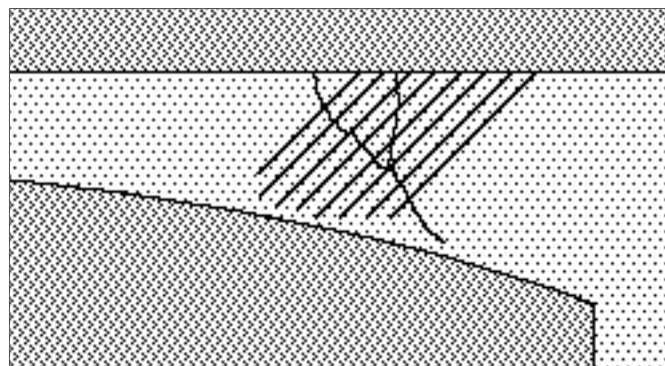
Reinforcement added to strengthen member. Holes are drilled at right angles to the crack, then filled with epoxy before bars are inserted.
